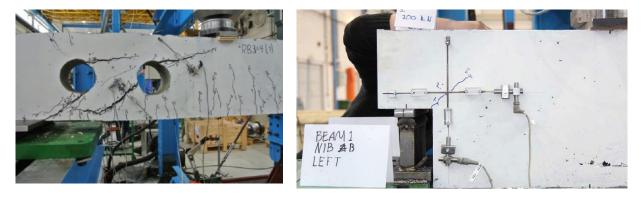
Fibre reinforced structural concrete elements tested to verify design methods proposed in pre-normative publications.
